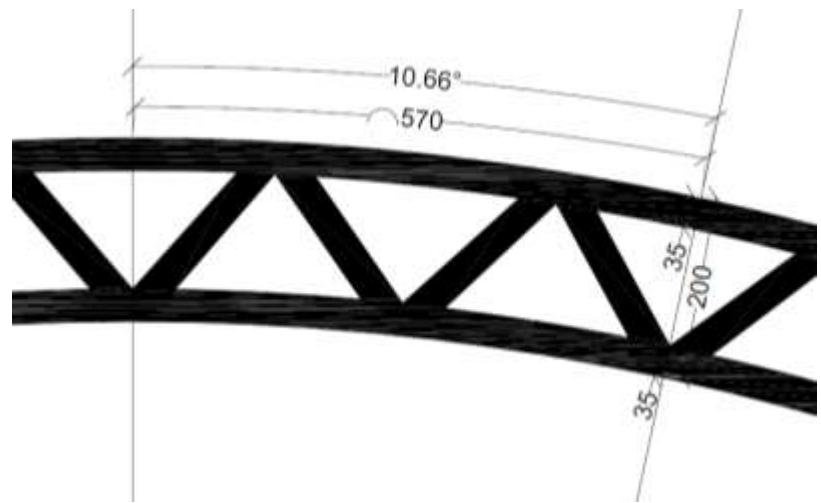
Close-up of one extruded part in a horizontal cross-section at the top of part D
